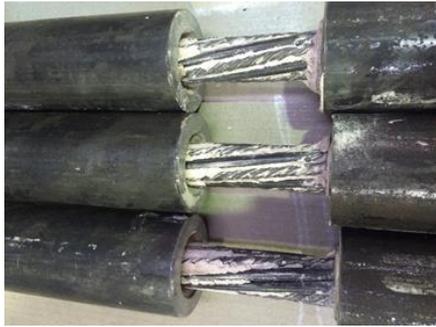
Post-test pulled out cable Figure 13: Close-up view of pulled out cable
